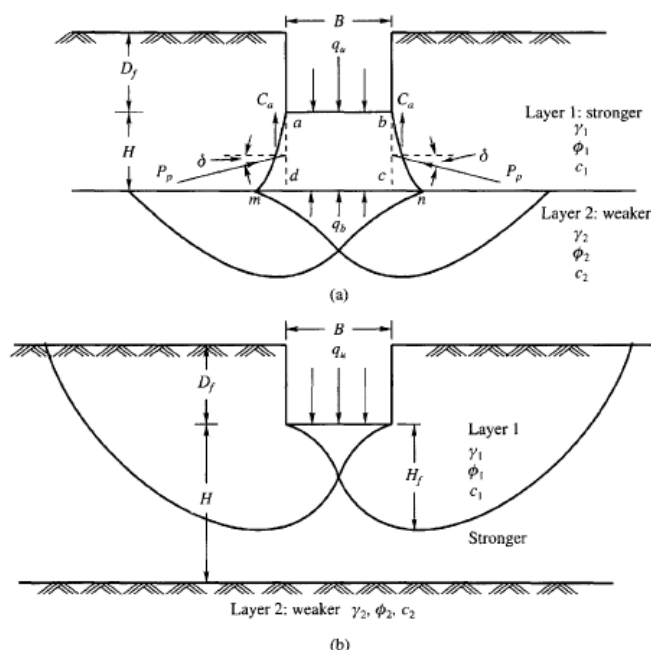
Failure of soil below strip footing under vertical load on strong layer overlying weak deposit (after Meyerhof and Hanna, 1978)
